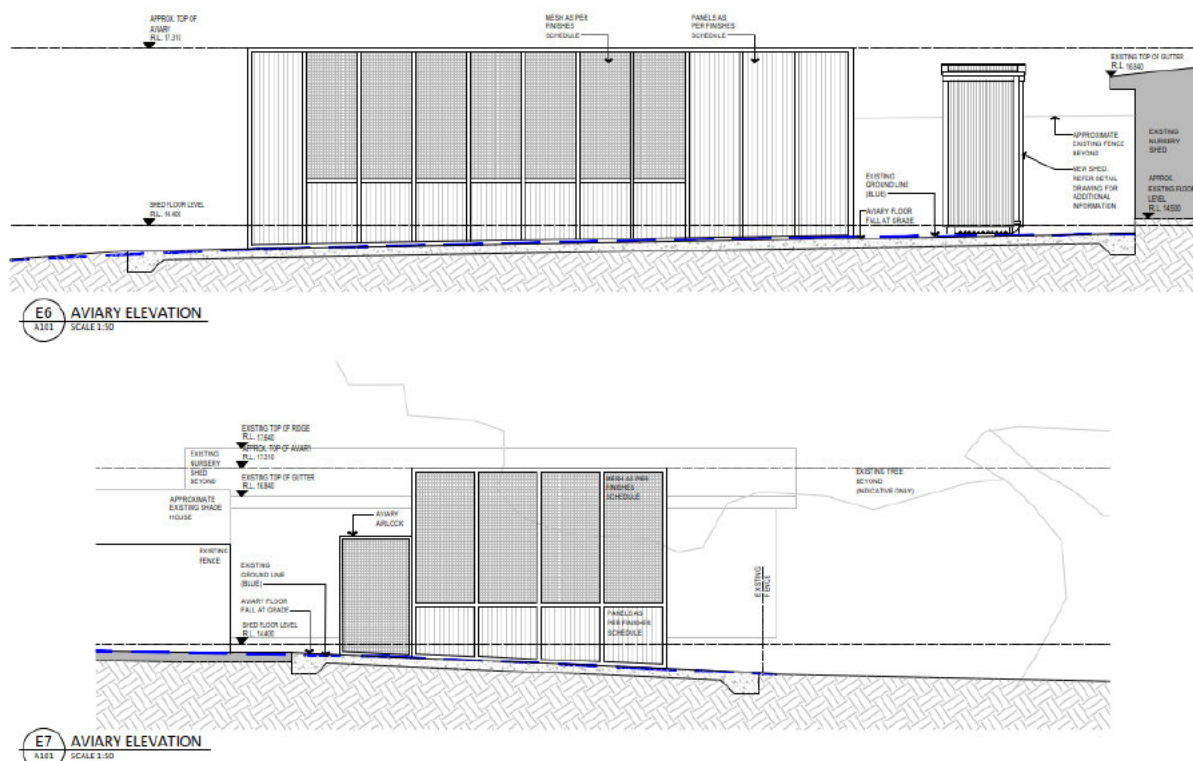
Extract of the proposed elevations of the Aviary Enclosure (Source: Drawing No. DA201 of the Architectural Plans prepared by MDP Architecture).
